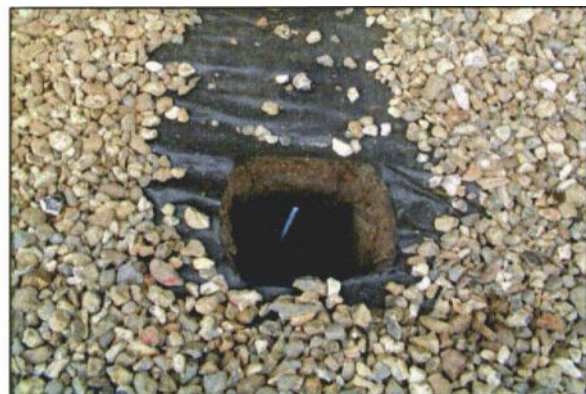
Ground protection must be used to spread the load of the piling rig once excavation has confirmed that no substantial roots are in the preferred pile location.
